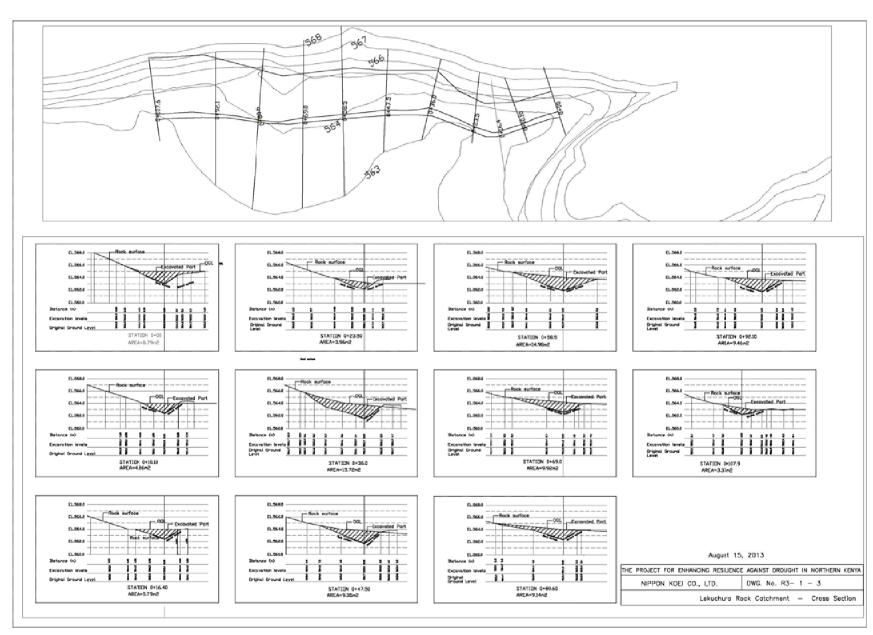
Plan of Lekchura Rock Catchment
